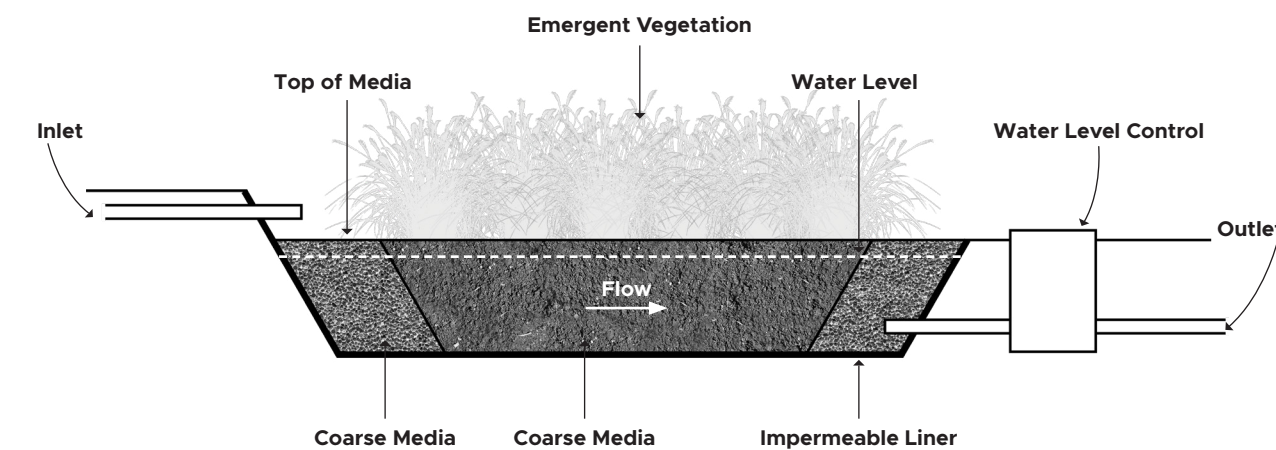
Horizontal Subsurface Flow Constructed Wetland Section
